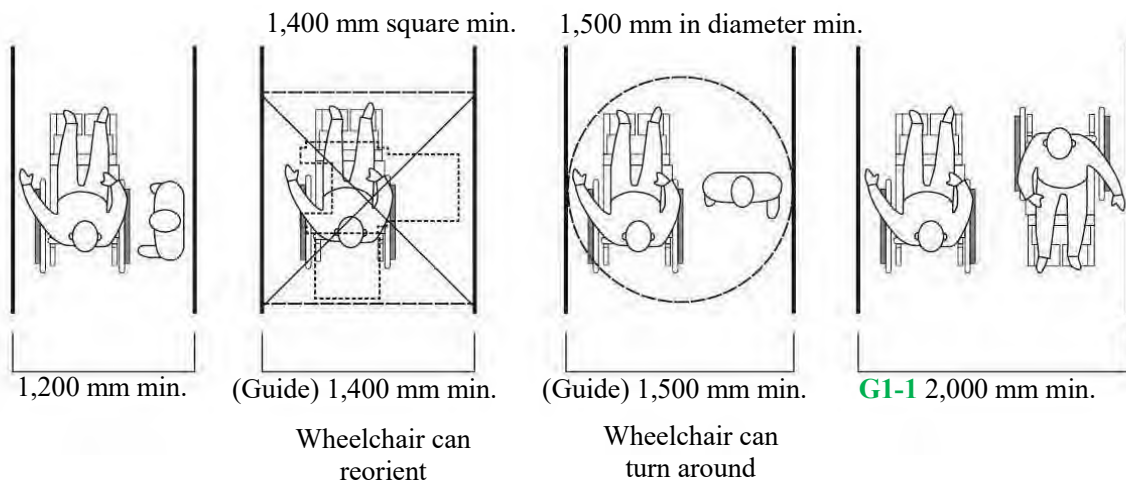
Effective widths of passageways on plot (outdoor)
